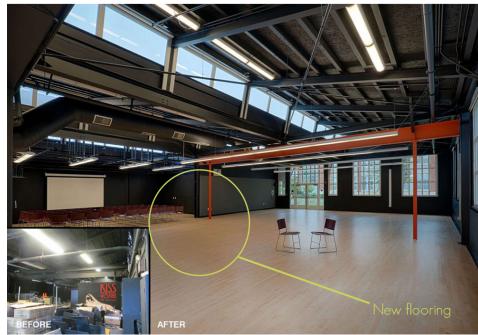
San Mateo High School art studio with new timber flooring (AIA Redwood Empire, 2016)
